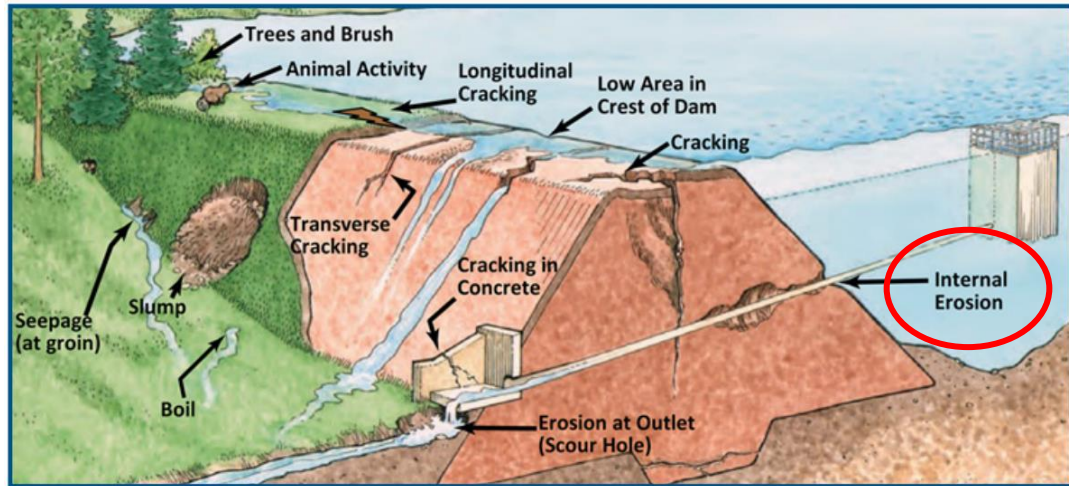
Internal erosion and other failure observations in an earthen dam (FEMA, 2016).
